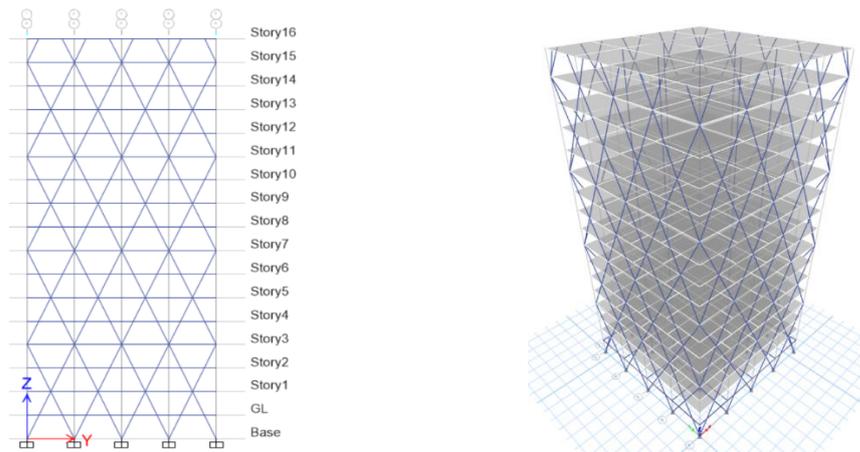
Elevation and 3D View of Braced Frame building Model 2
